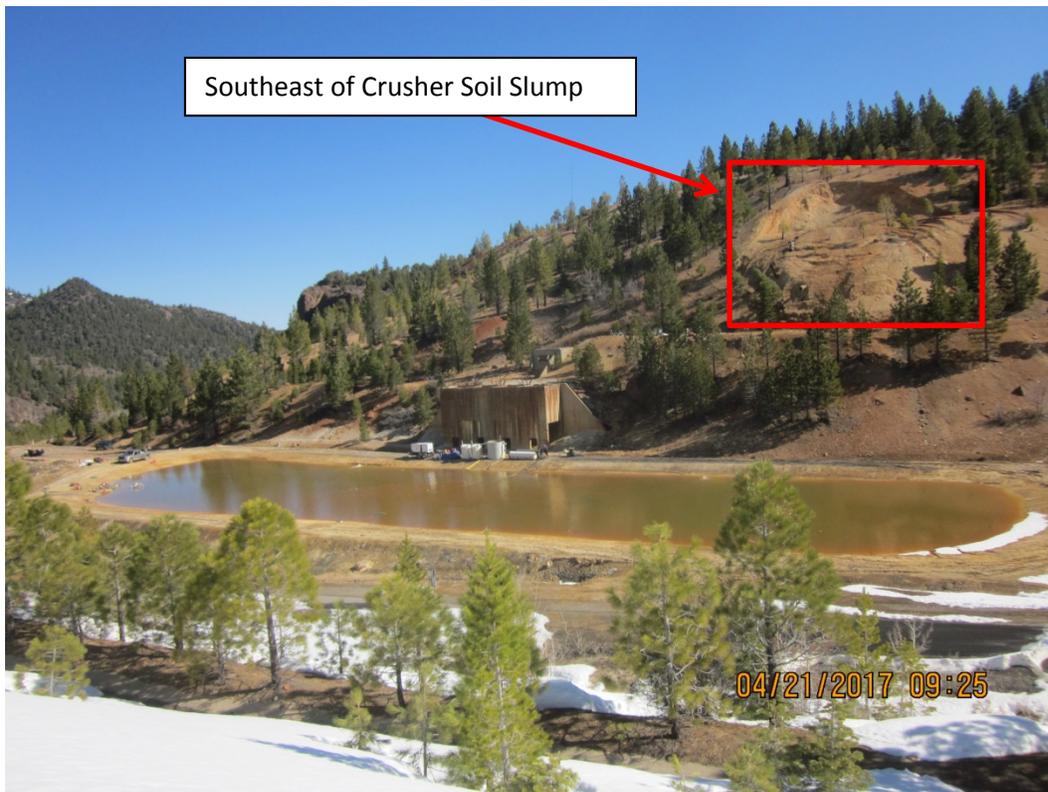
April 21, 2017, further development of the Southeast of Crusher Soil Slump
